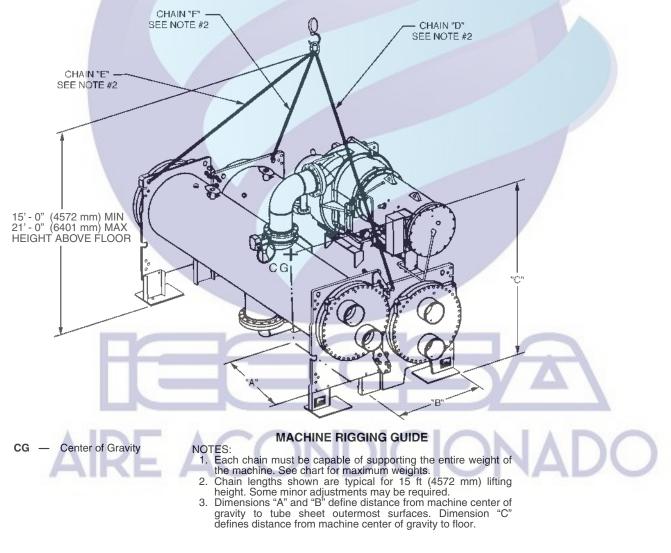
Machine Rigging Guide (Heat Exchanger Size 70 Through 8Z) with Free-Standing or Unit-Mounted Starter
